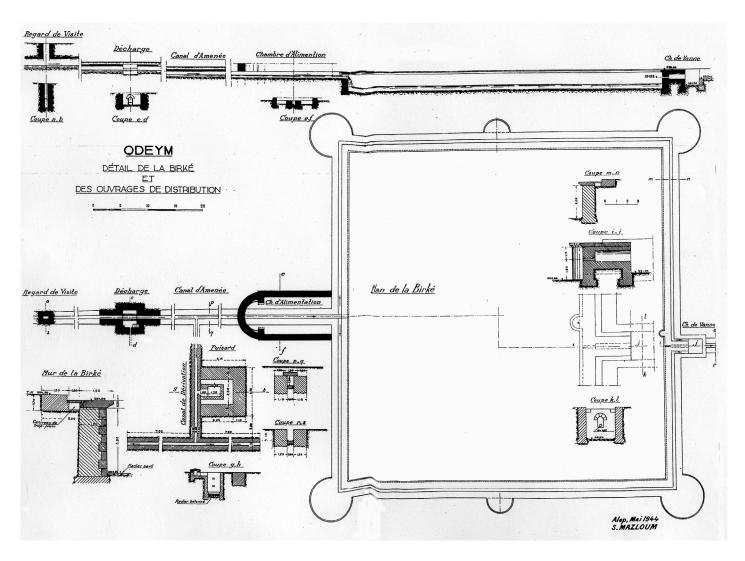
Plan of the terminal reservoir on the qanat at Birke de Qdeym [Mouterde and Poidebard 1945, plan 5].
